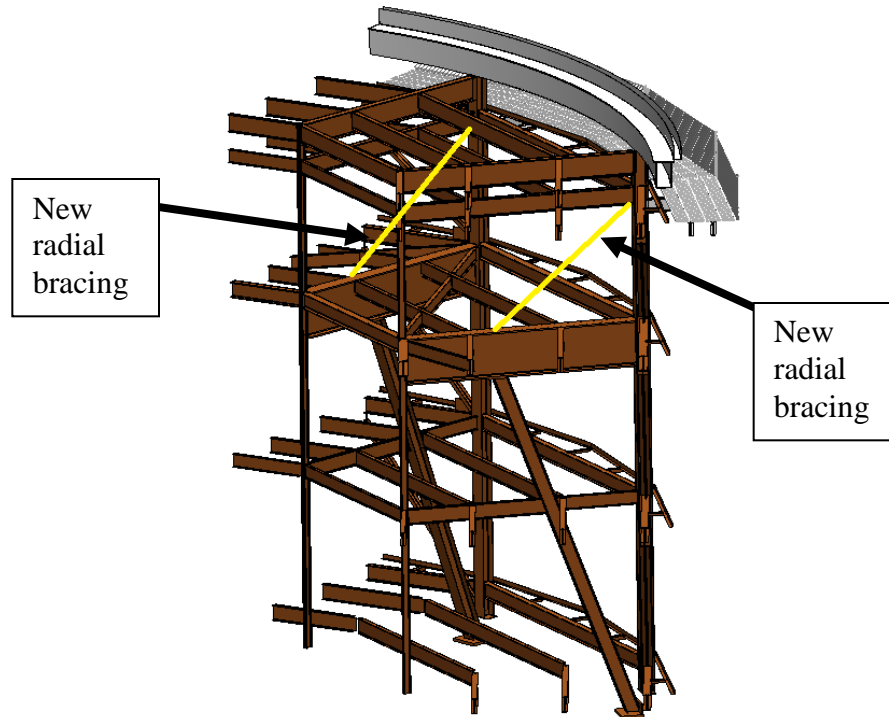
Section view of the existing building steel structure (brown) and new radial bracing members (yellow)
